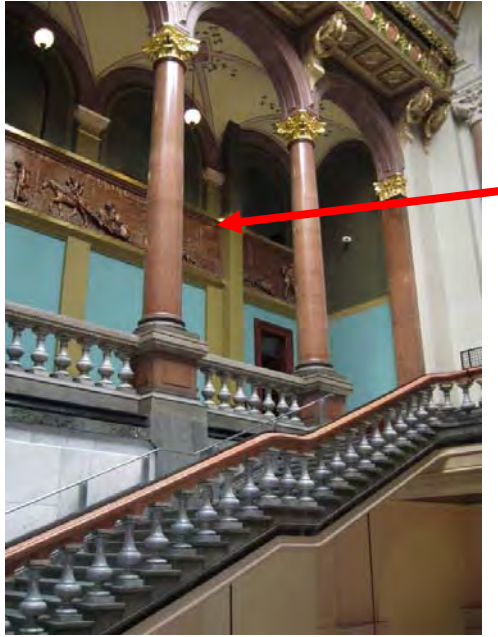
Contemporary view of added cast iron column at west wing third floor.
